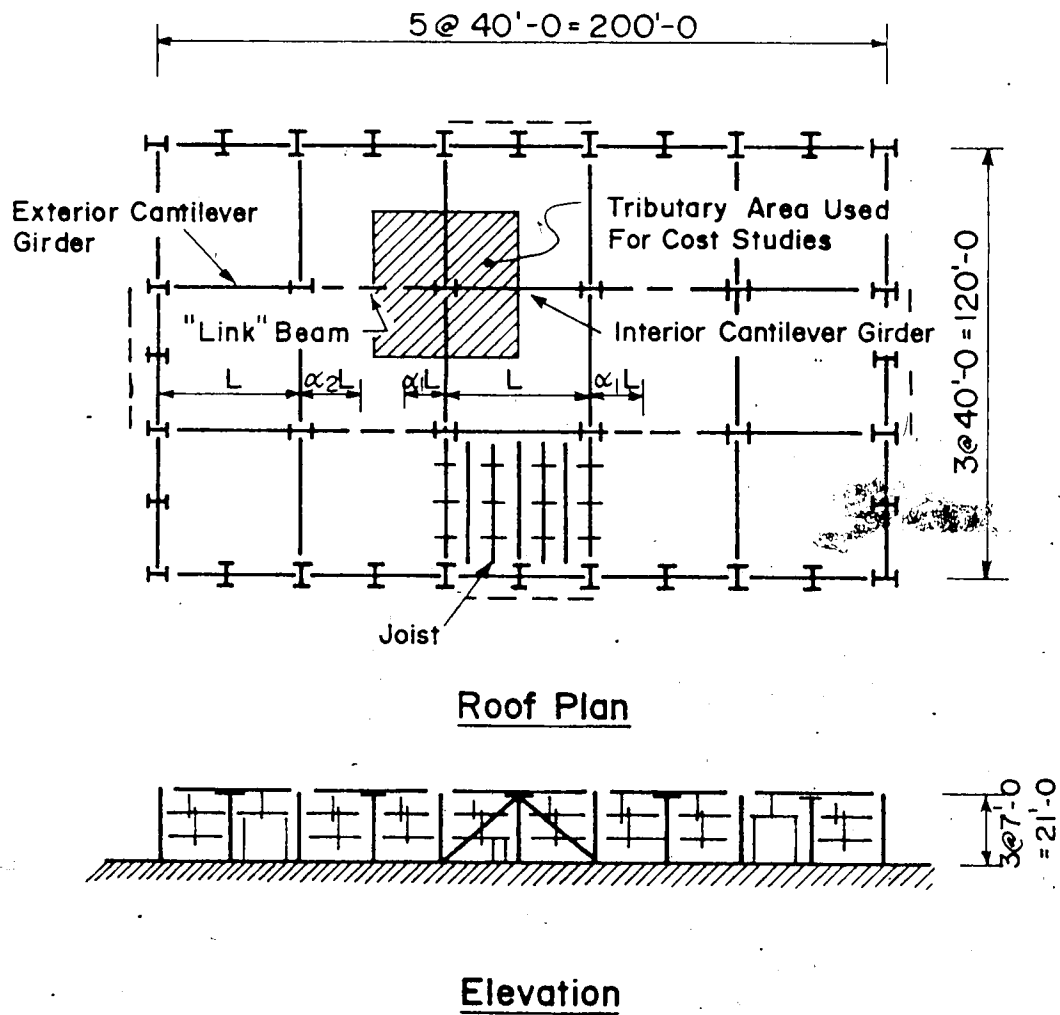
PROPOSED LAY-OUT OF EXAMPLE BUILDING
